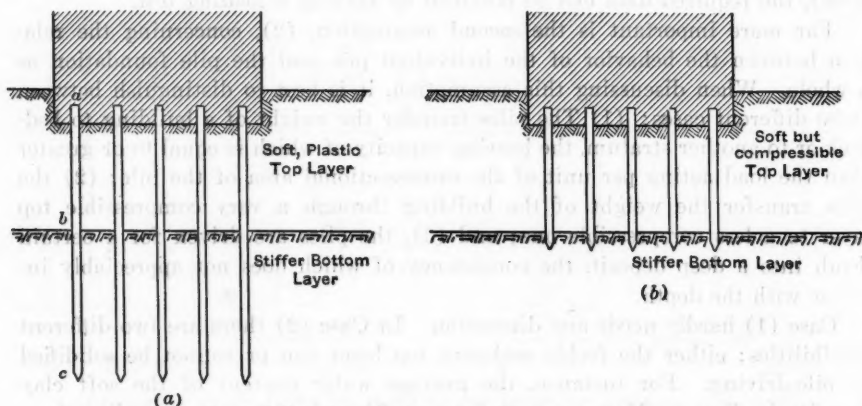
PILE FOUNDATION ON A TWO-LAYER SYSTEM.
